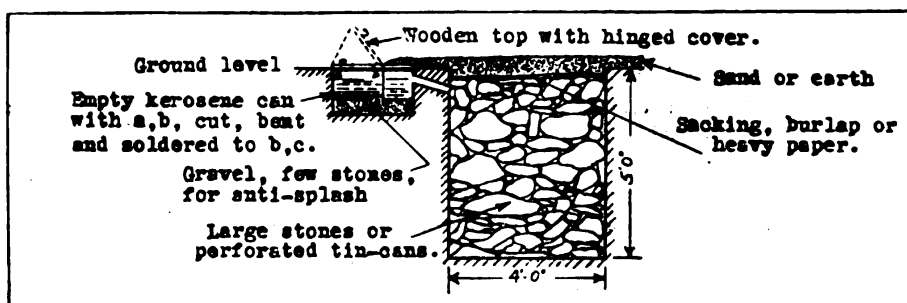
Cross section of soakage pit for waste water with grease and soap trap.
